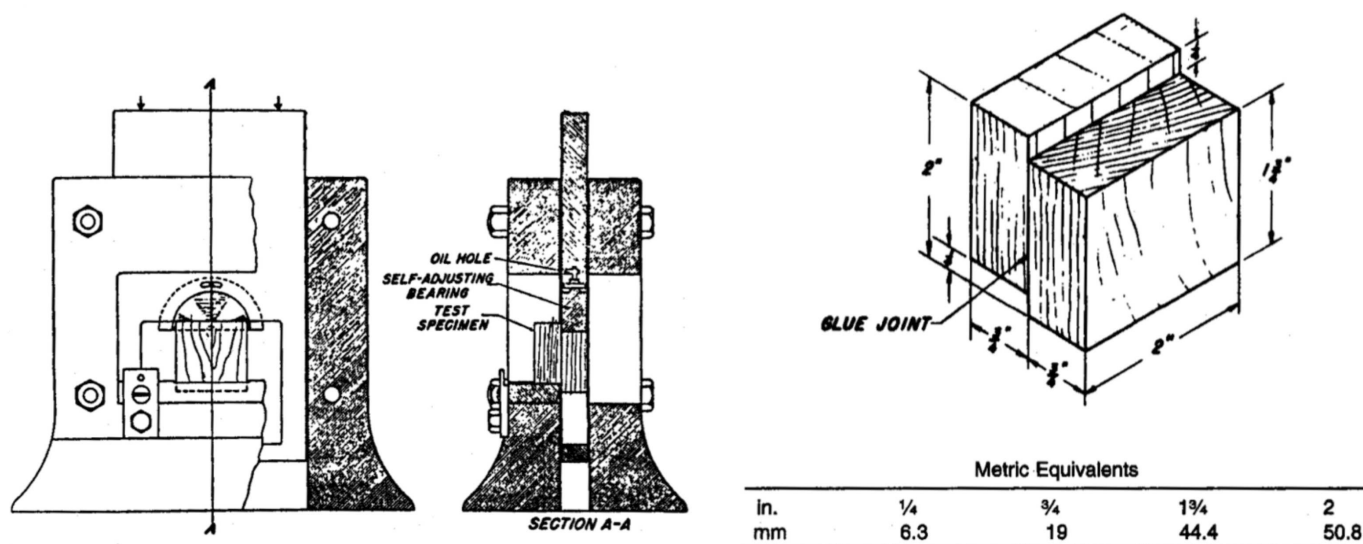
~ ASTM D 905-03 shearing tool and test specimen to derive shear strength of bondlines (ASTM 2003).
